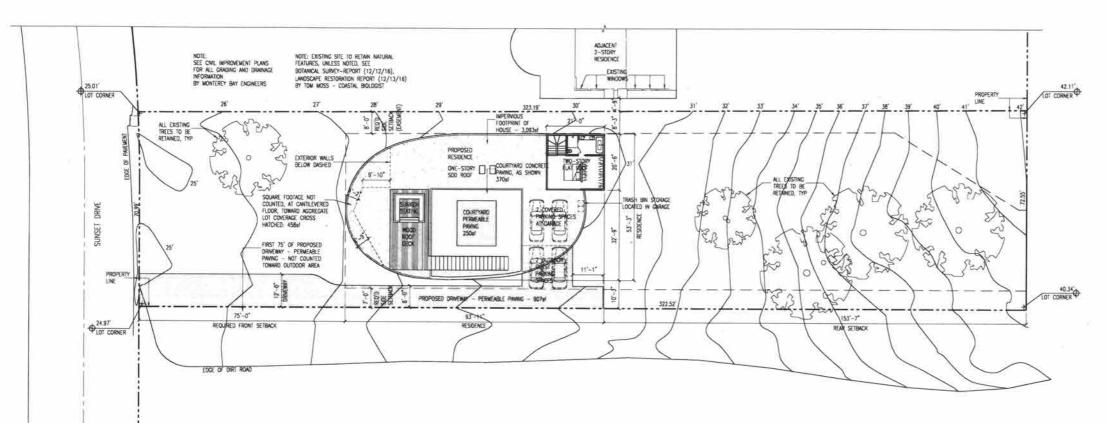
PROPOSED SITE PLAN (12/20/16)
